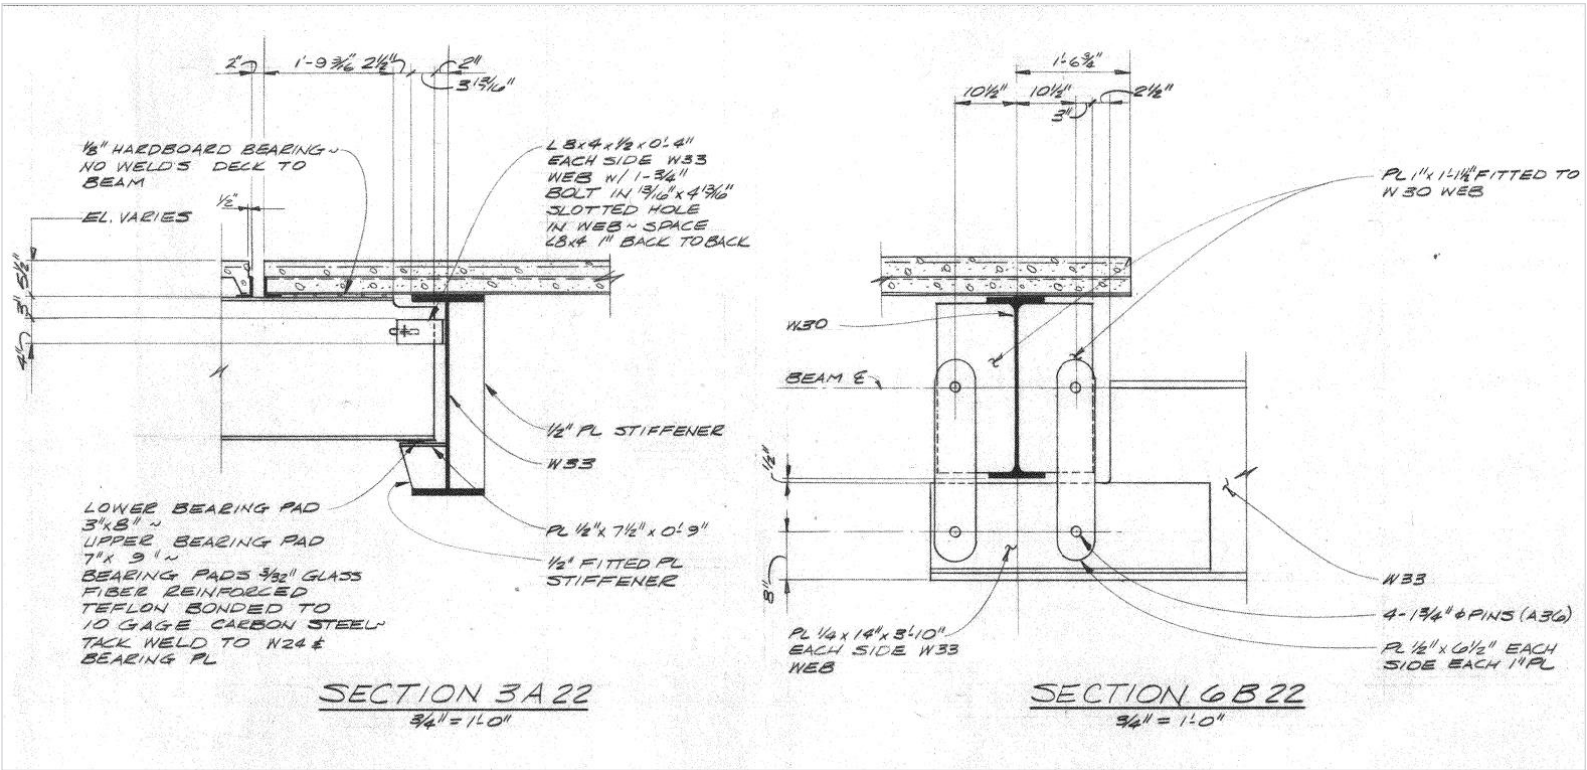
Original structural drawing details at superstructure expansion joints
